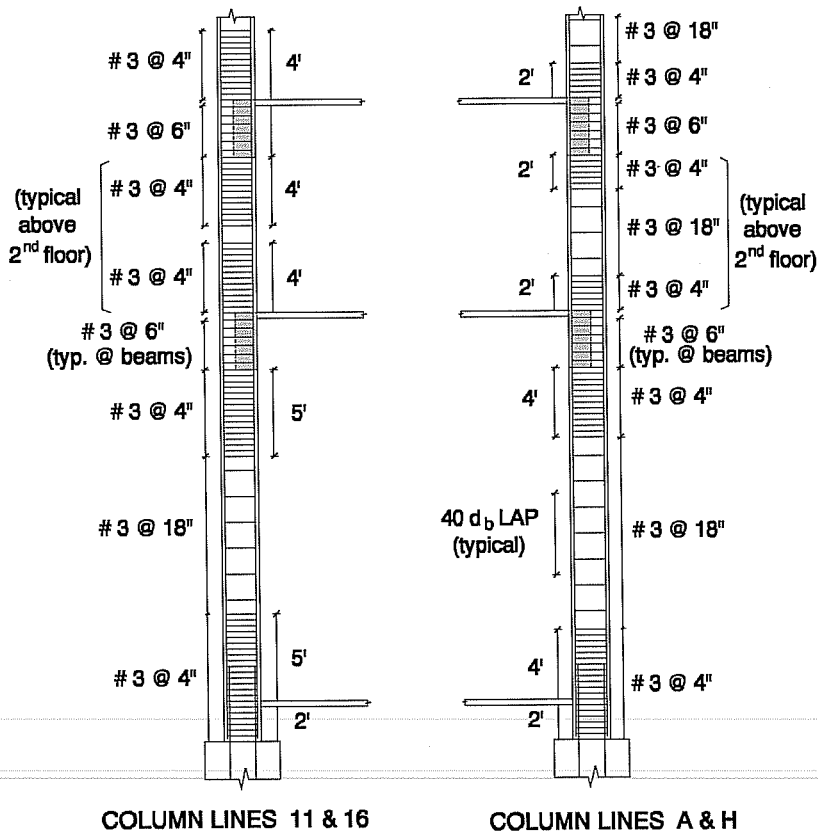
Tie configuration for perimeter frame columns of the 12-story building.
